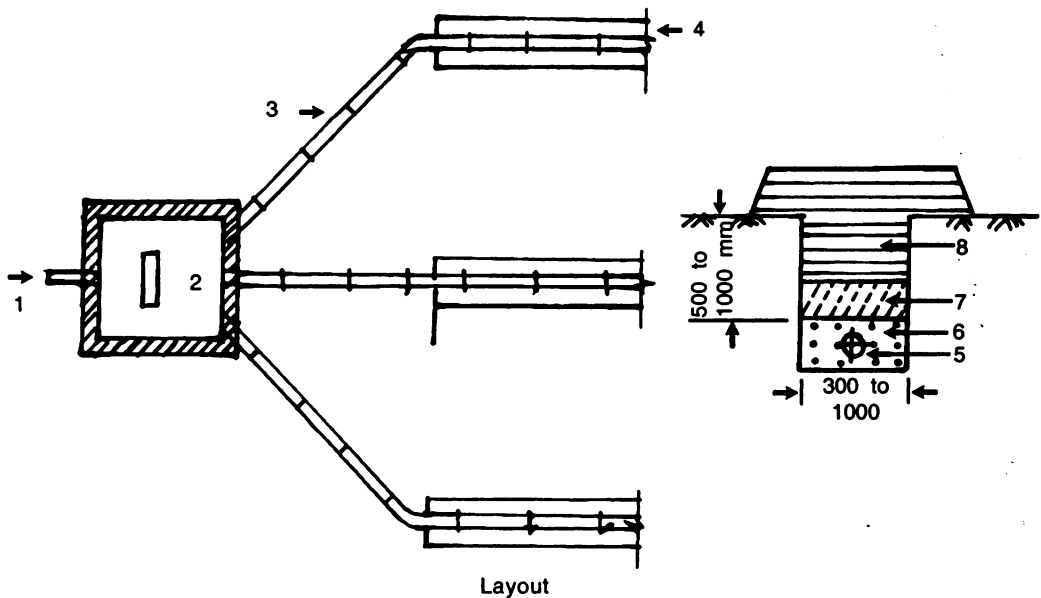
Details of dispersion trench: 1. Effluent from septic tank, 2. Distribution chamber (1 x 1 m) with baffle at centre to distribute the flow, 3. 75 to 100 mm stoneware pipes laid with tight joints, 4. Unglazed stoneware pipes laid with open joints and large end downstream, 5. Stoneware pipe, 6. 15 to 25 cm depth of gravel or crushed stones, 7. 15 cm graded coarse aggregate topped with sand, 8. Earth filled to 15 cm above the ground level and turfed.
